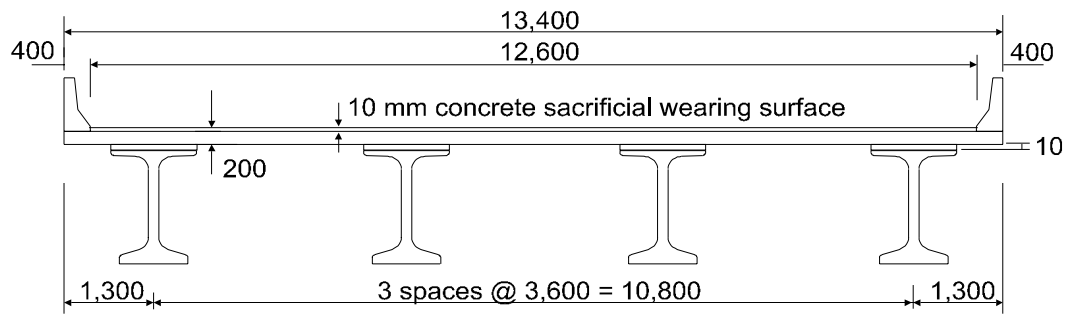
Bridge Cross Section (all dimensions are in mm.)
